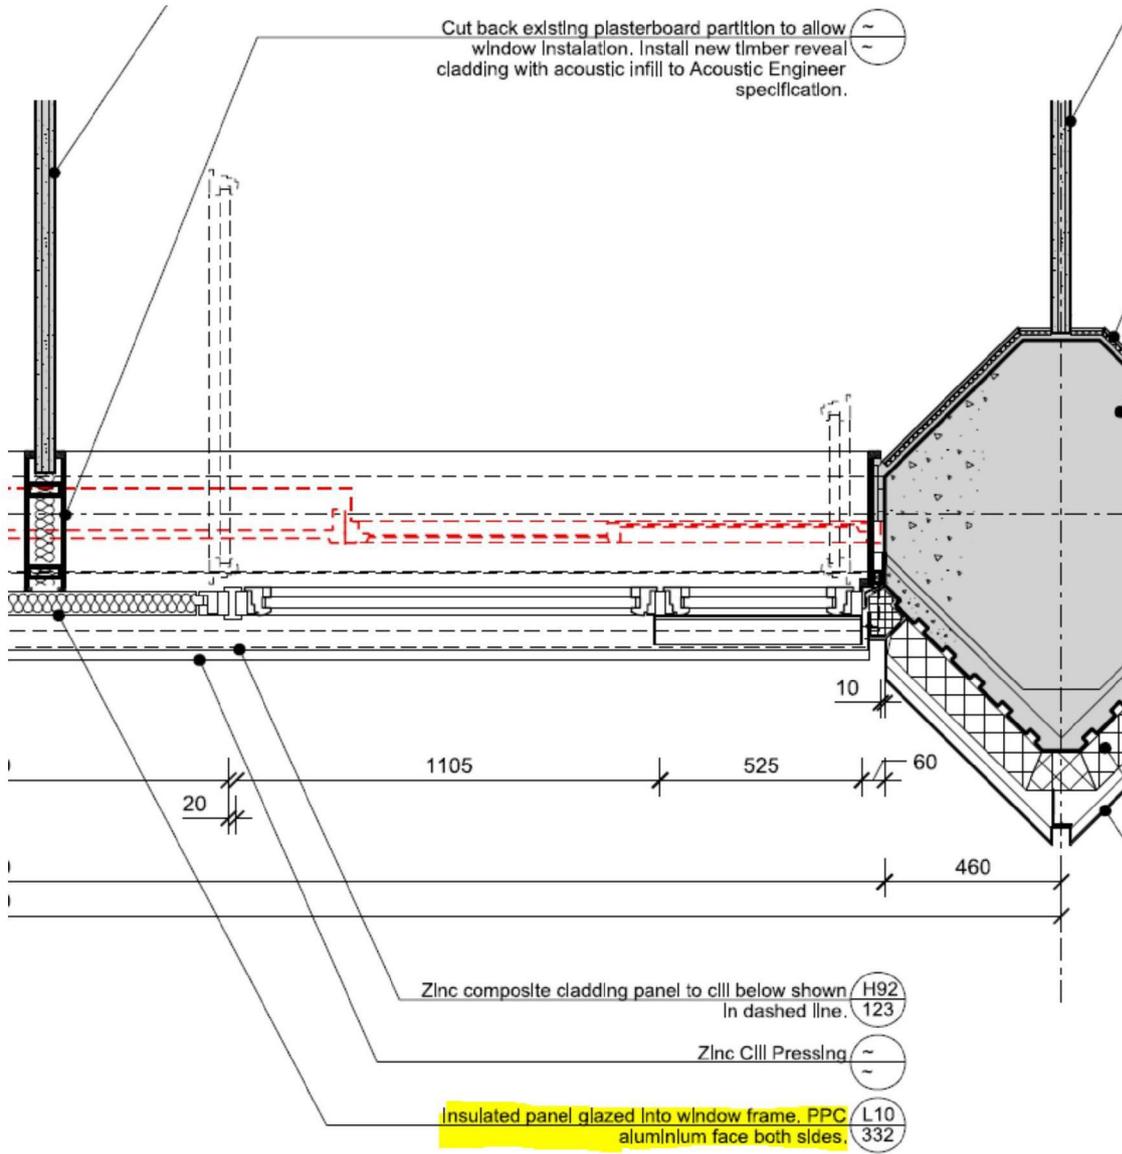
Extract of 'Proposed Plan at Window Level' from drawing 1279 (06) 110 00 'Proposed Typical Bay, Plans, Section & Elevation' {SEA00002499}
